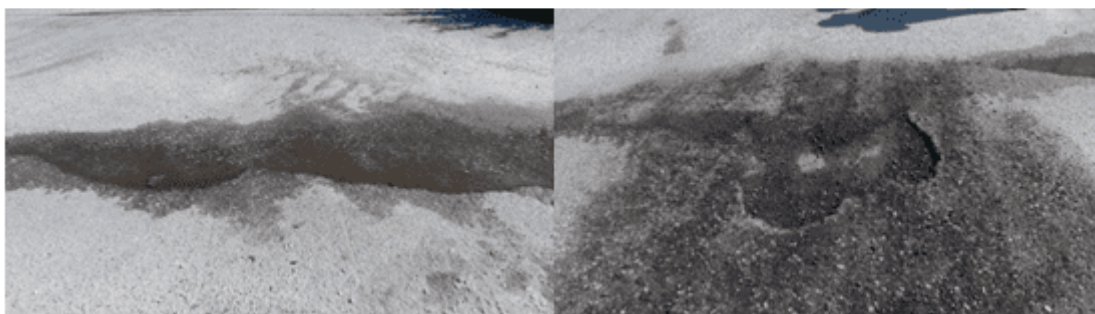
Examples of existing surface damage of HMA pavement
